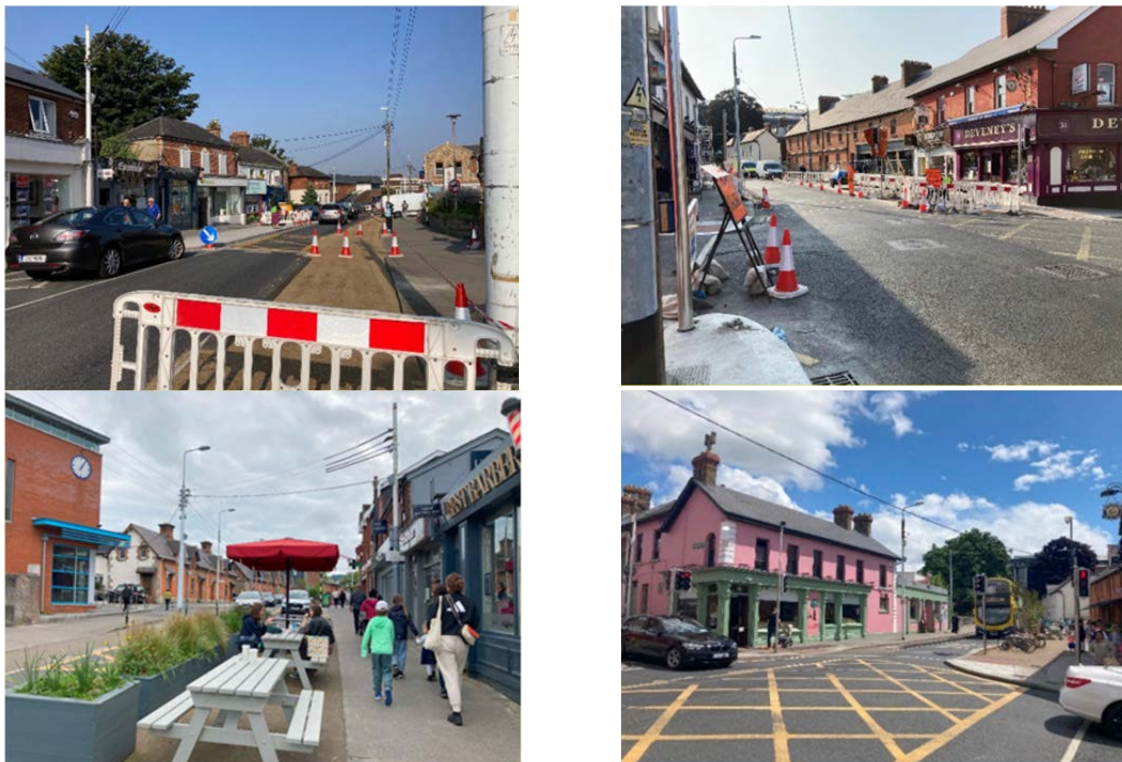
Existing and Proposed Stage 1 (Engineering/Road Space Reallocation Phase), Blackrock Main Street
